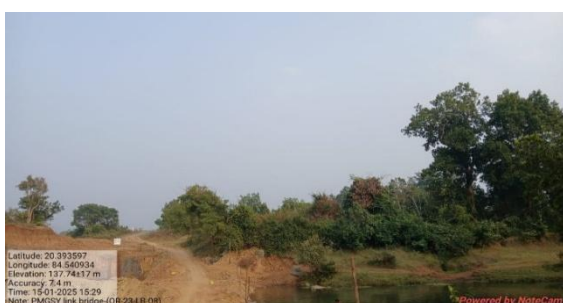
Bridge over River Kuanria without approach road (Date: 23 December 2024)
